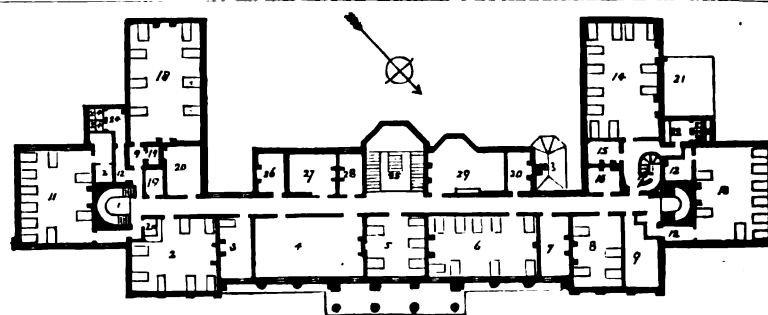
PLAN OF FIRST FLOOR BEFORE ALTERATION.
